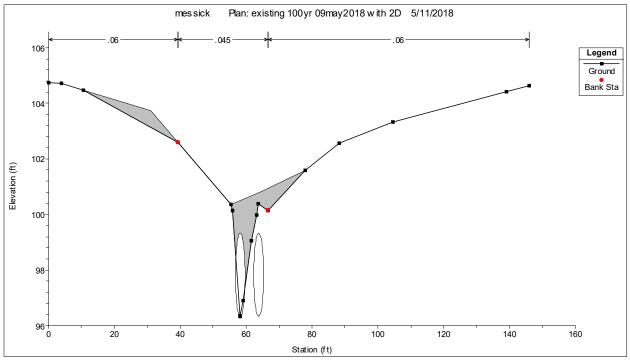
HEC-RAS cross section for the existing low water crossing (upstream side)
